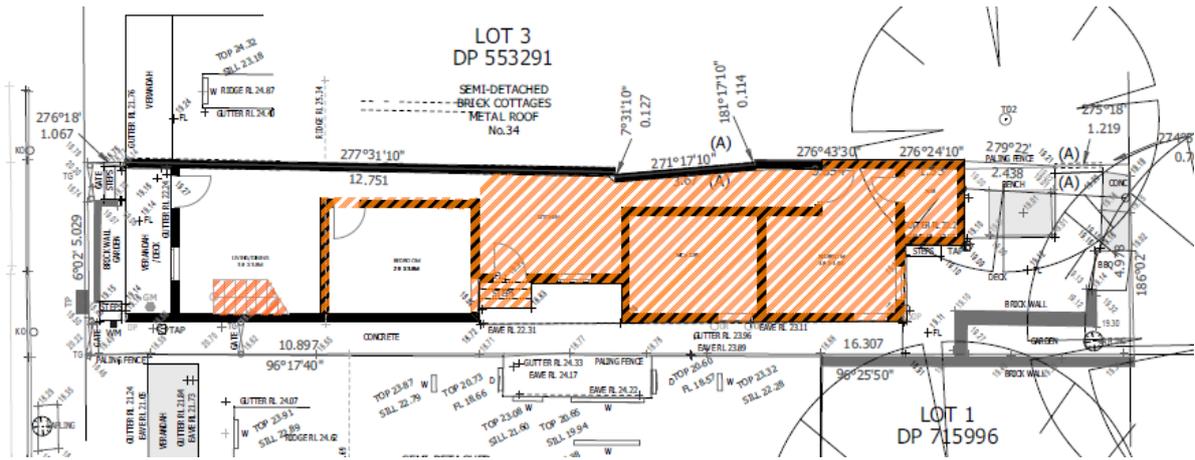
Demolition Plan - Ground Level (extent of demolition hatched orange)
